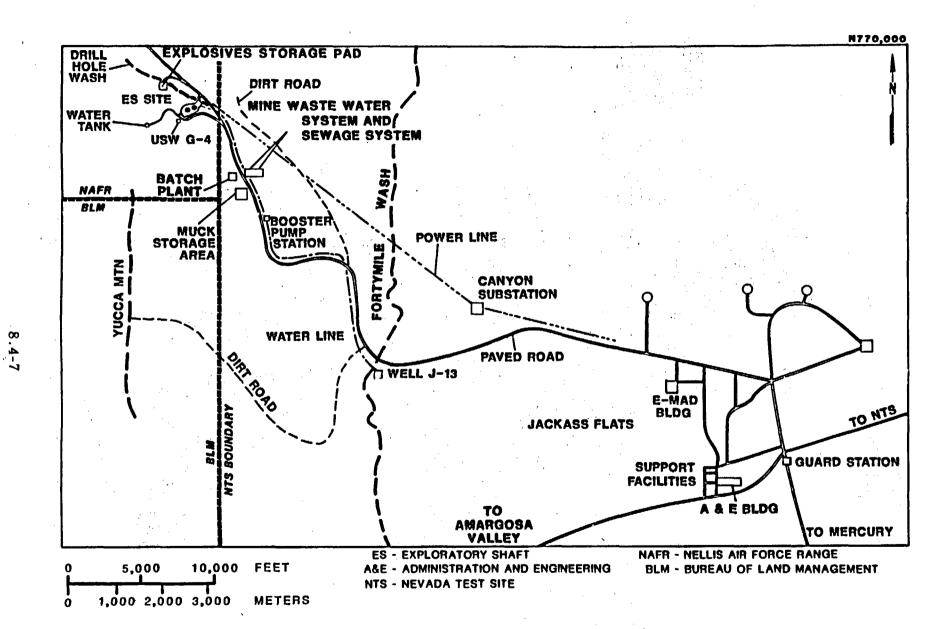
Location of facilities required during construction of the exploratory shaft facility.
